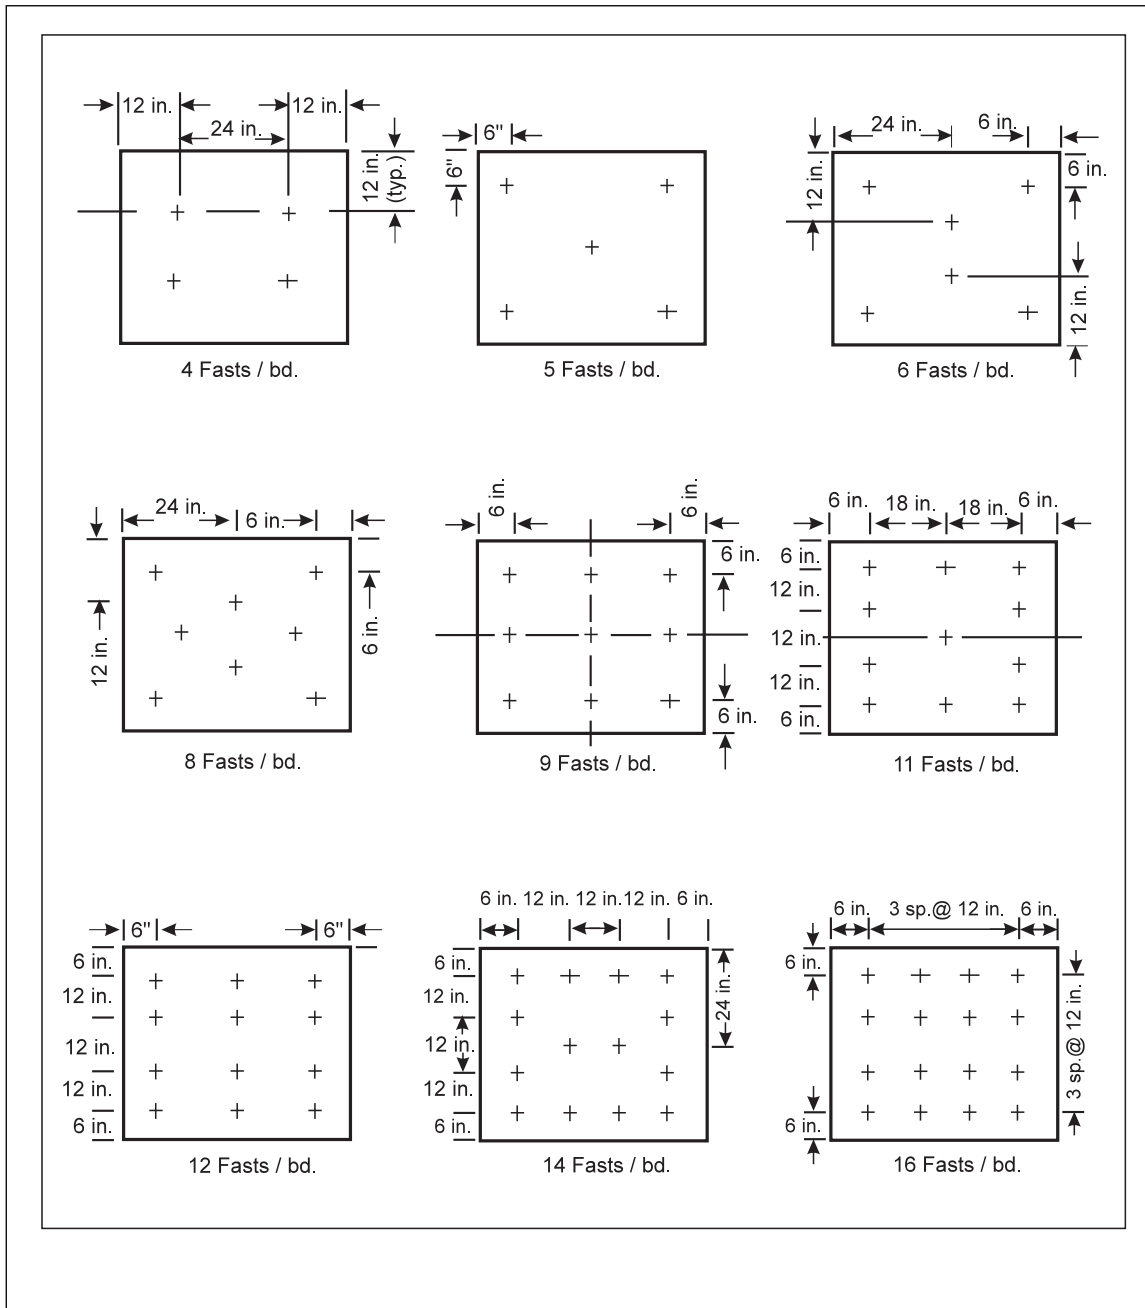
Fastener placement 4 x 4 ft (1.2 x 1.2 m) boards used on steel decks with a 6 in. (150) module or rib spacing
